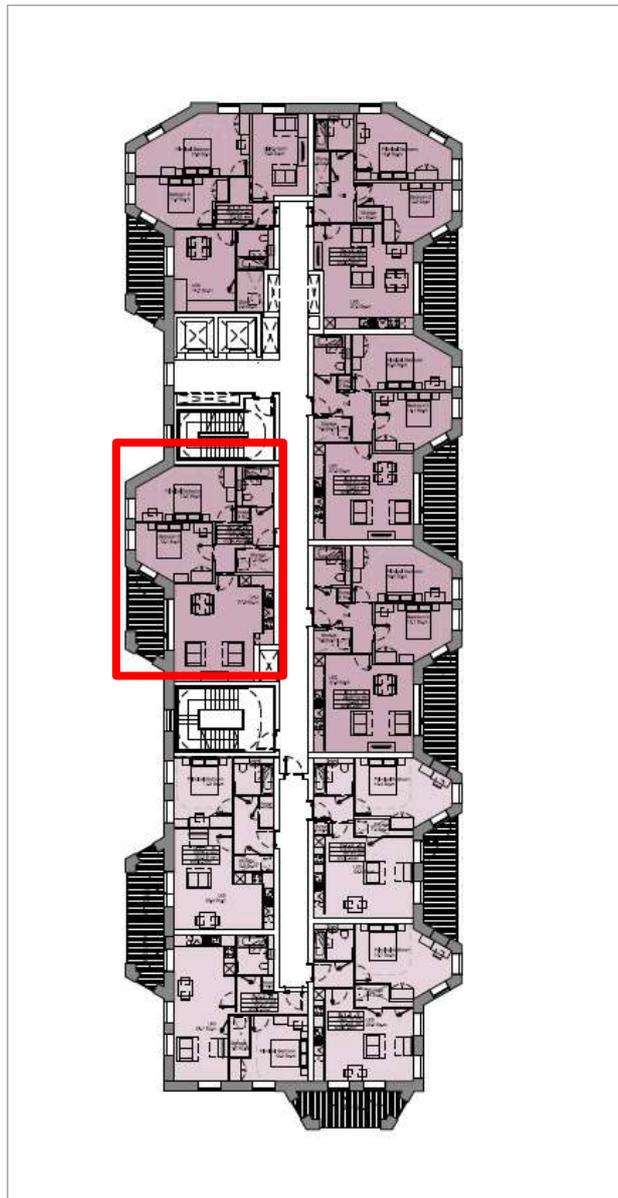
Block B, 2nd floor selected middle floor 2bed dwelling facing west (Patel Taylor drawings 21.09.2020).
